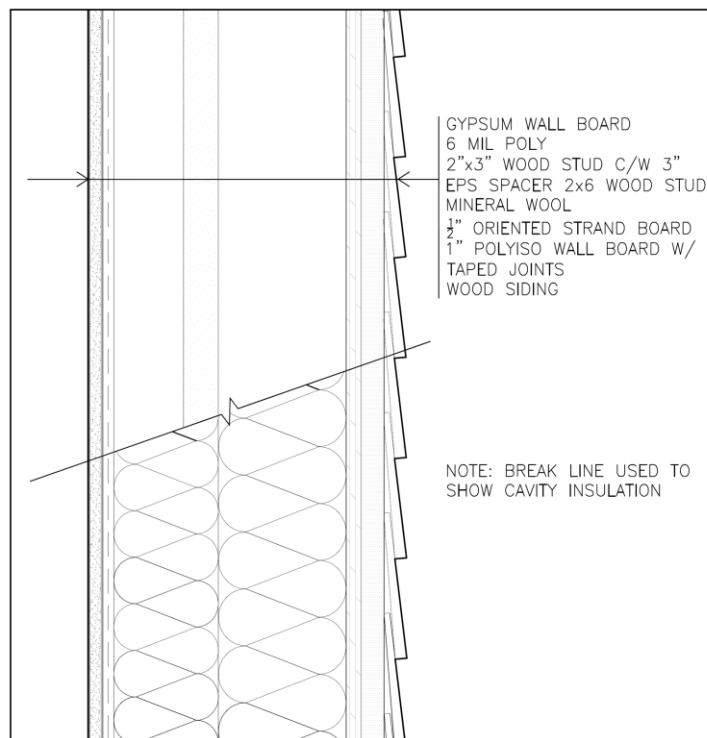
Wall Assembly Cross-Section (Twiddy, 2011)
